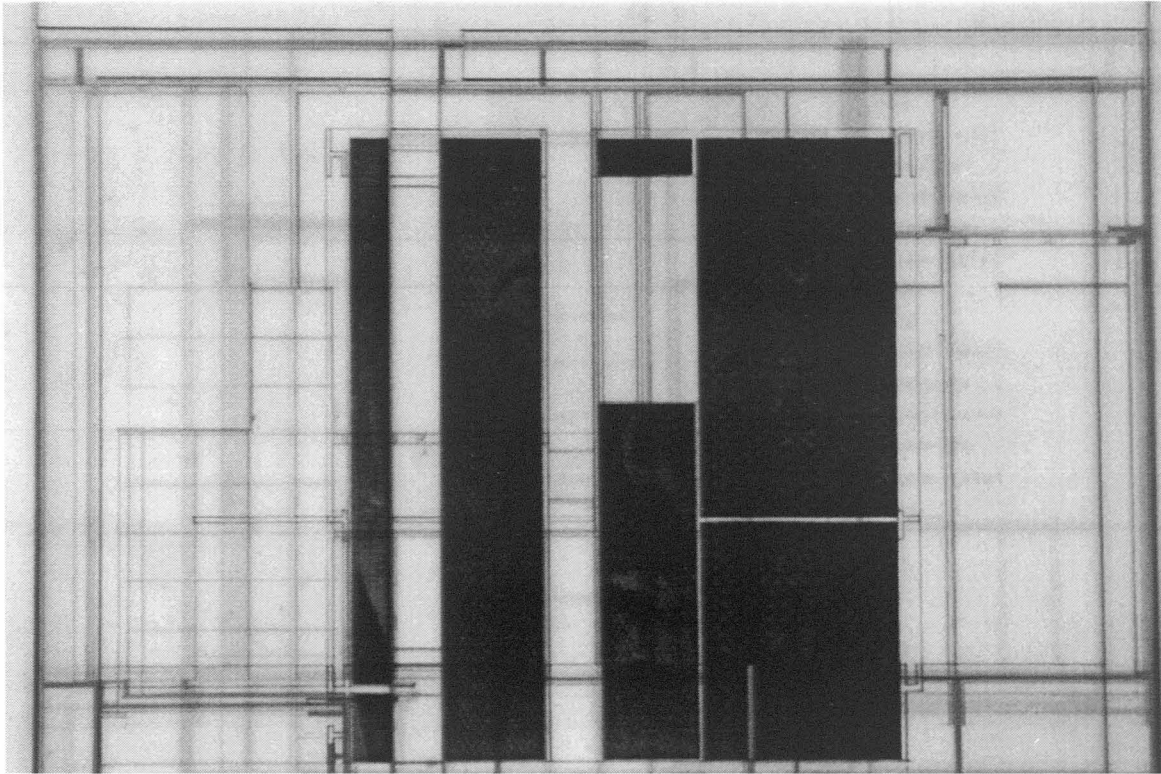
State Street Elevation- James Madison's Fac(ad)e
